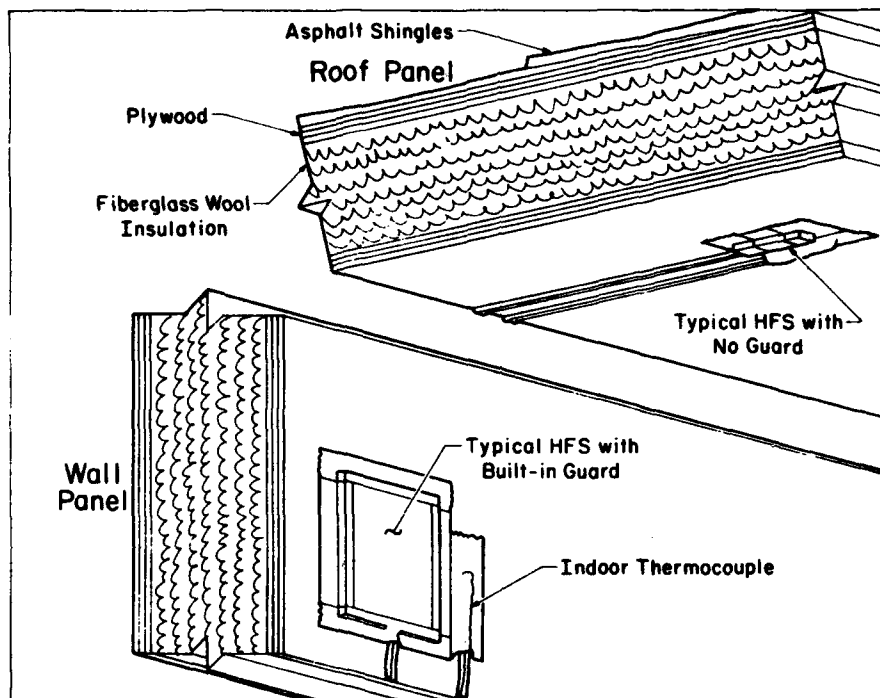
Typical construction of the frame building, incorporating 2x4s spaced 40.6 cm on center in both the roof and wall.
